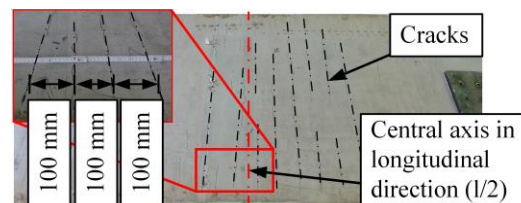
Regular transversal crack pattern in longitudinal direction on the top of the concrete slab.
